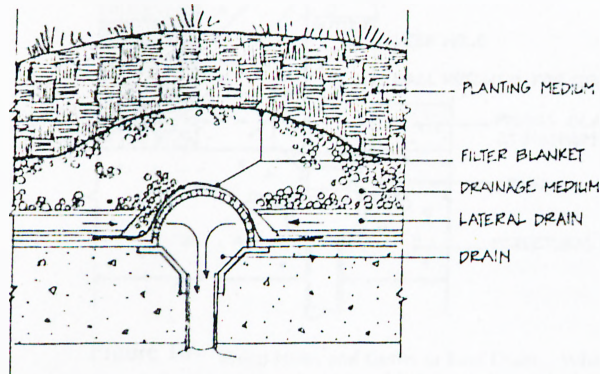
Main Roof Drain under Planting. Main roof drain can be located under a thickened section of the drainage medium, which is protected by a filter blanket. A second filter blanket over the drain strainer and the ends of the lateral drain pipes prevents plugging of drain openings by planting medium.
